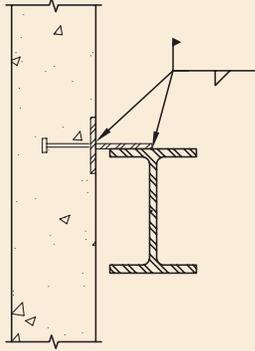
Welded tieback (WTB4).
